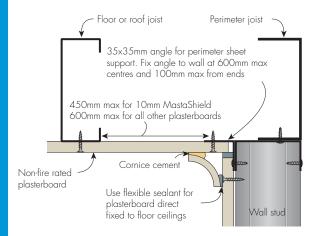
Angle Support For Ceiling to Wall Direct fixed to joist
